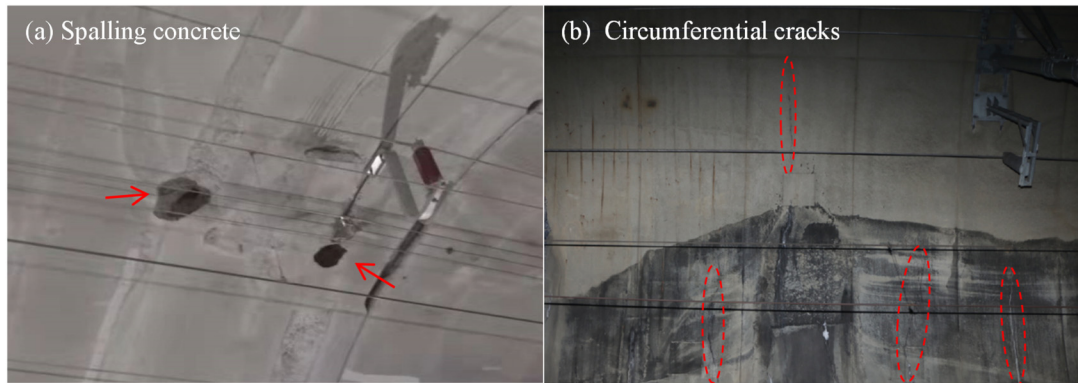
Photos of (a) spalling concrete blocks and (b) circumferential cracks.
